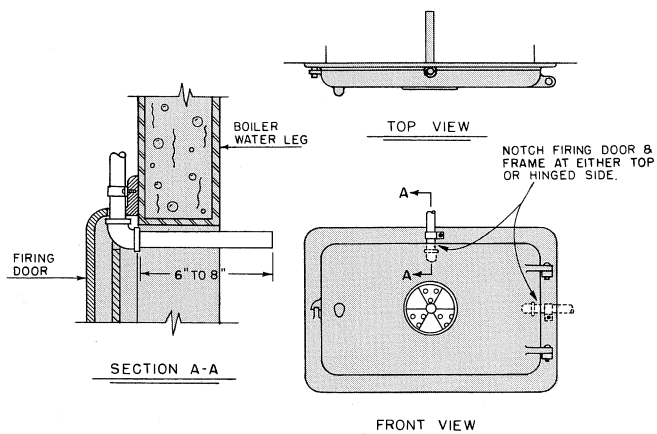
OPTIONAL FURNACE SAMPLE CONNECTION ON EXISTING BOILER
